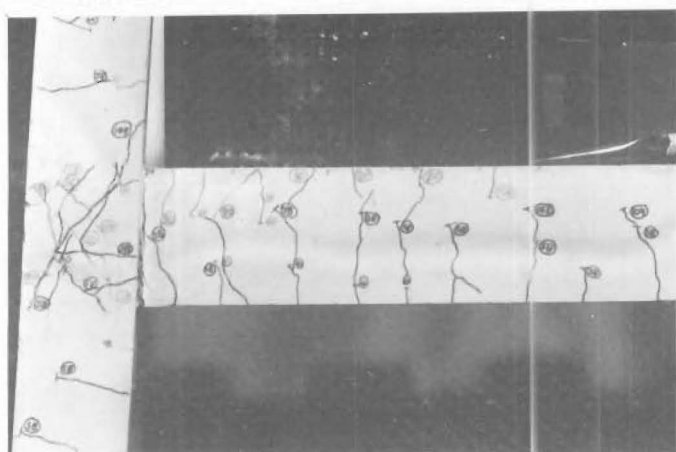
(a) : LONGITUDINAL BEAM AND COLUMN
